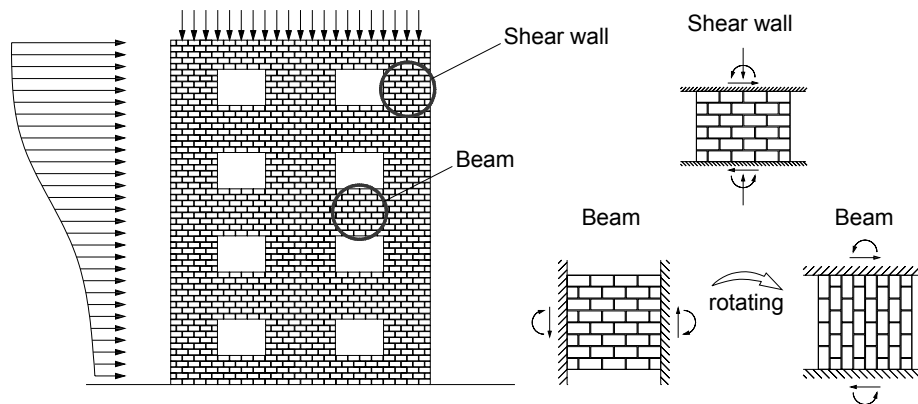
Equivalence between shear walls and masonry beams in real buildings
